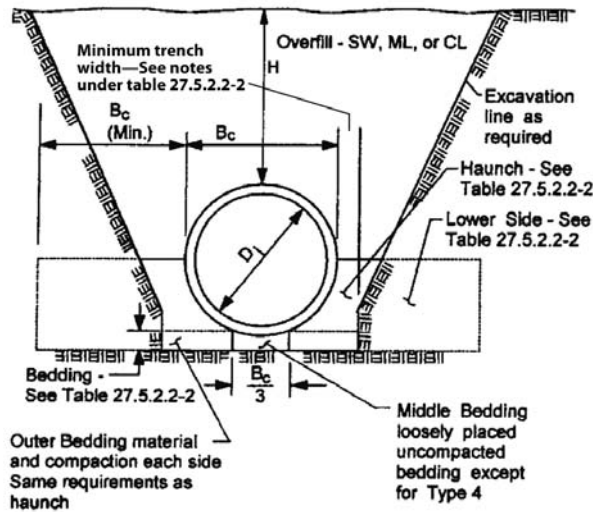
Standard Trench Installation—Round Pipe
